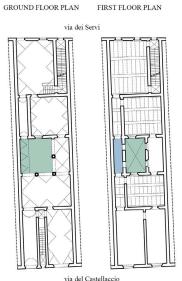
Reconstruction of the original configuration of the units: Ground floor (left) and First floor (right). Identification of the internal court (green) and of the additional cantilevered corridor on the first floor over the same internal court (blue).
